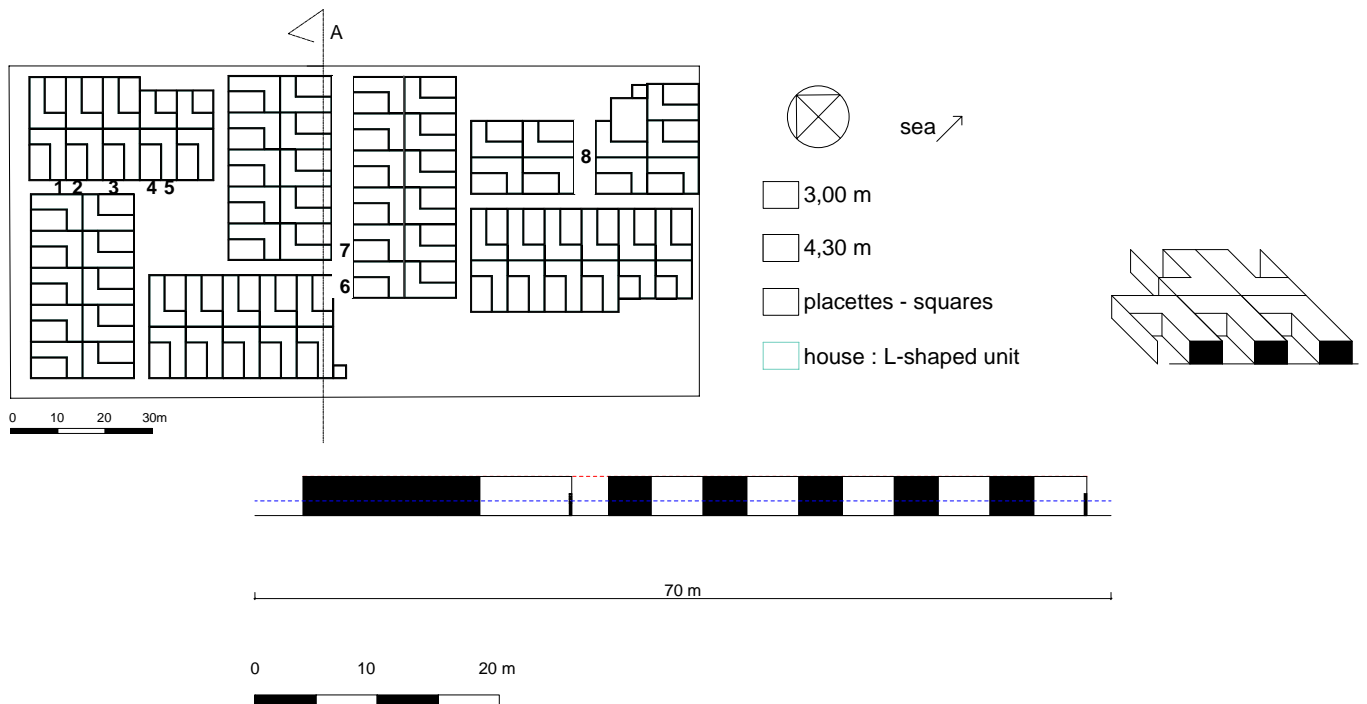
Ginestou. Left: Ground floor plan with pedestrian street widths and SVF locations. Right: schematic diagram of "L" units' assembly. Bottom: Section A.
